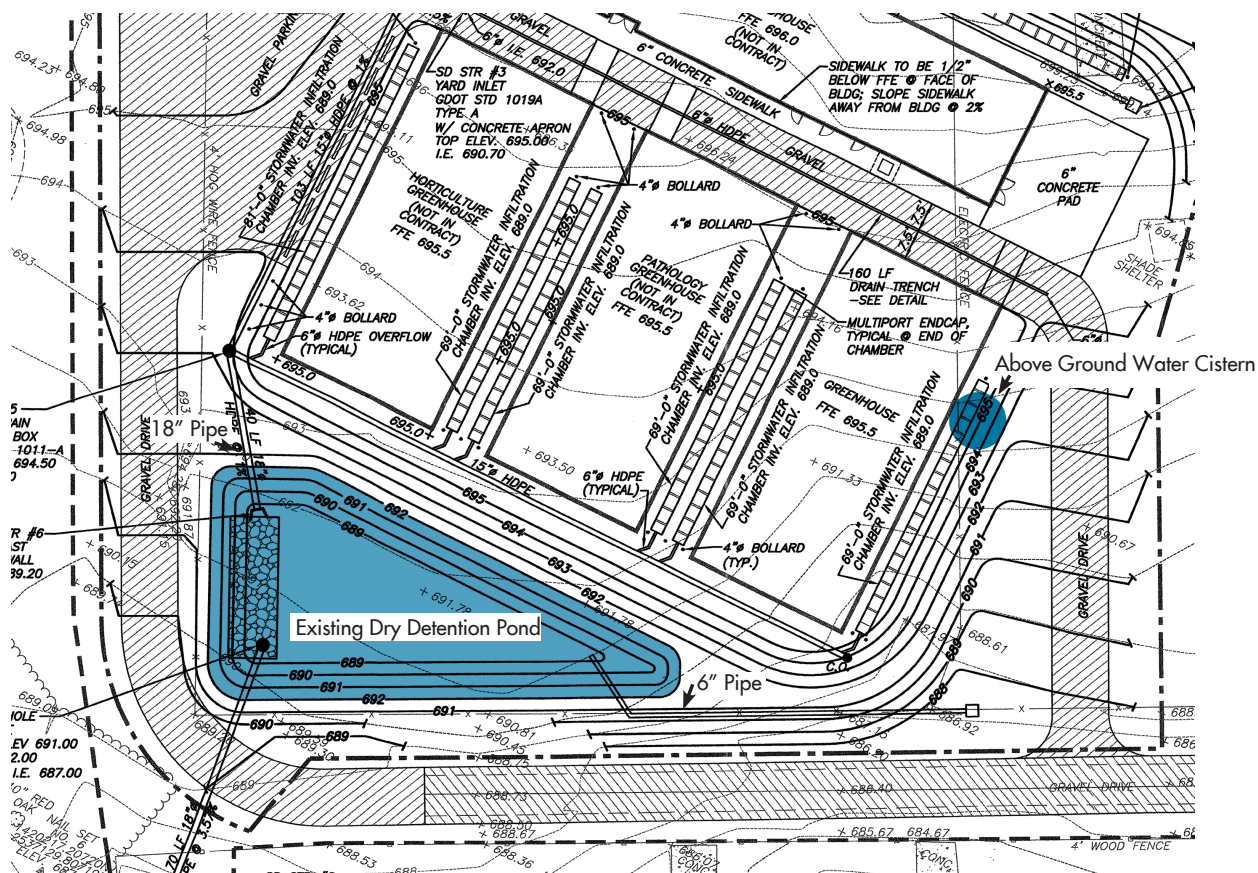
The location of dry detention pond at the UGA Greenhouse Facility.
